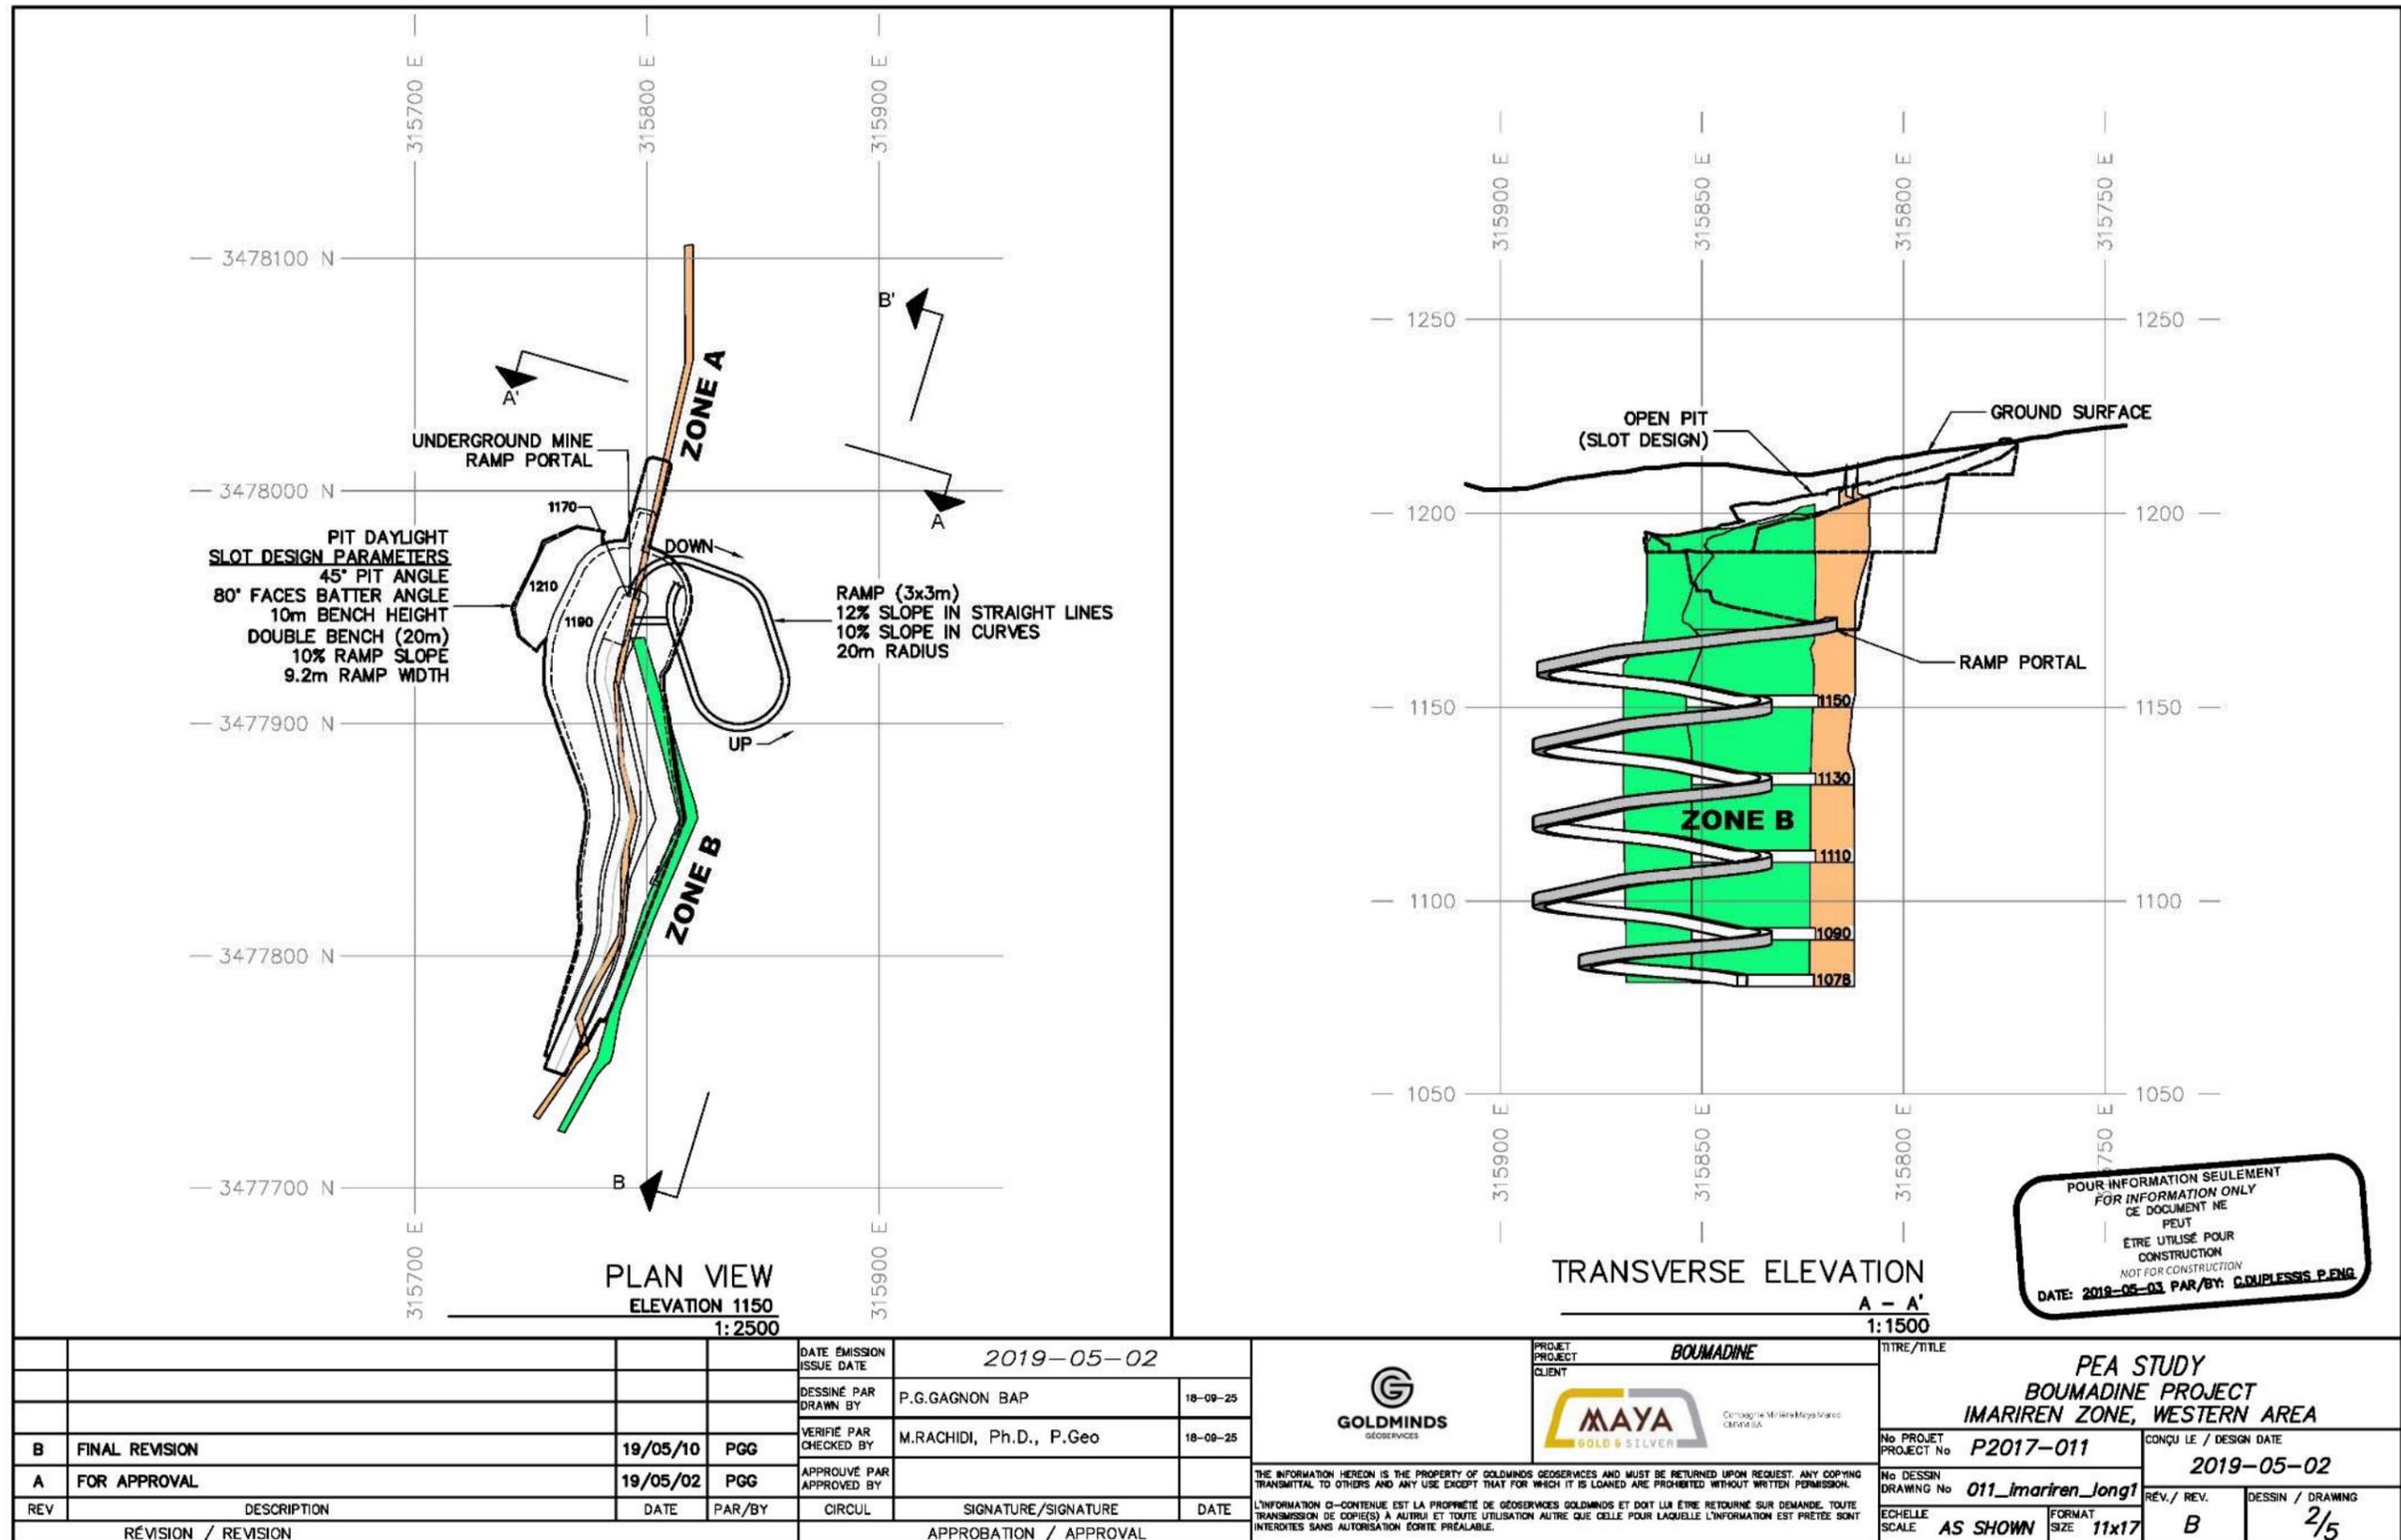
IMARIREN zone, western area, plan view and transverse elevation.
